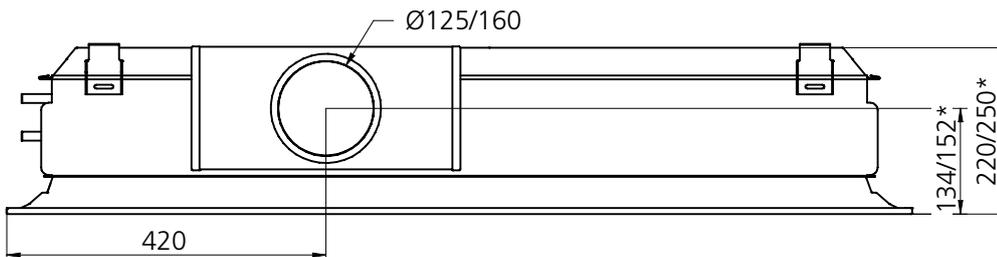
Dimensional drawing, side view. Air connection on the long side - pos 2.
